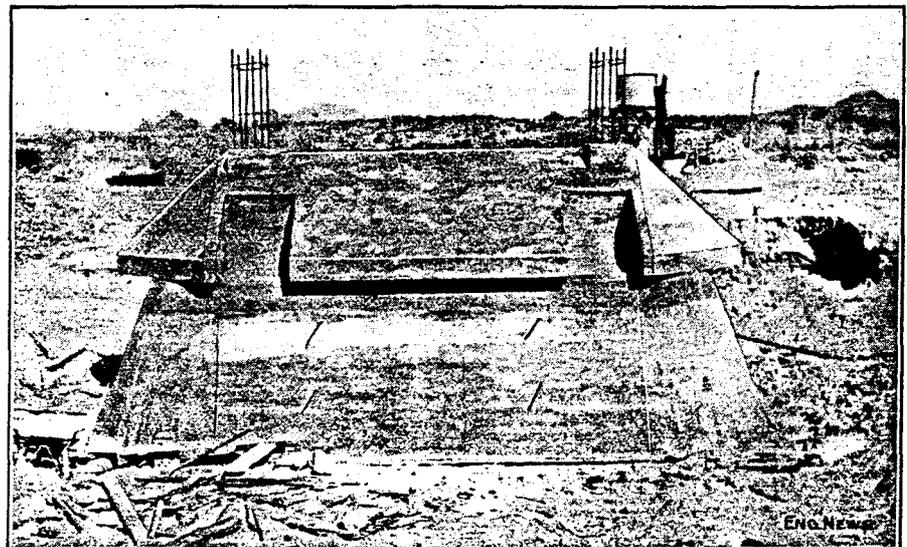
VIEW OF PIER 7 UNDER CONSTRUCTION
